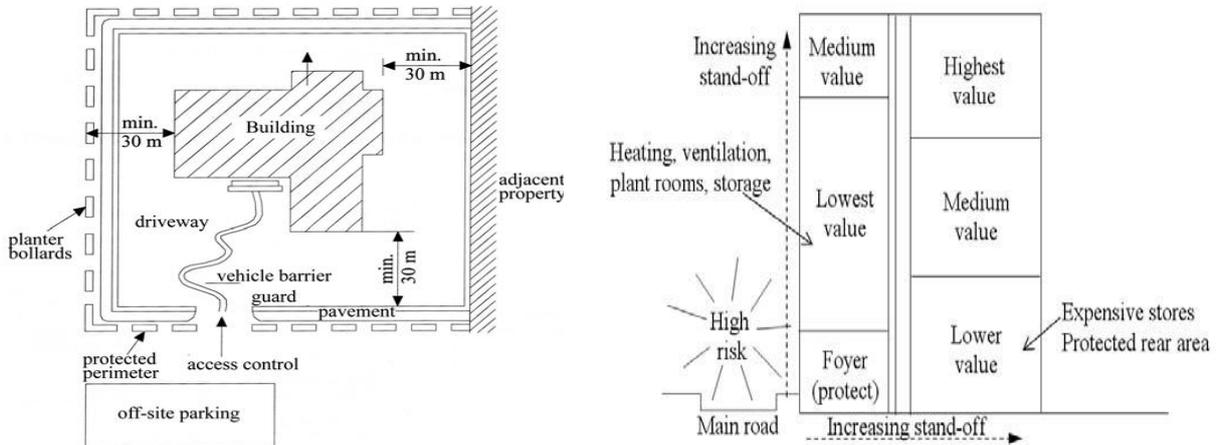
(a) Schematic layout of site for protection against bombs, (b) Internal planning of a building
